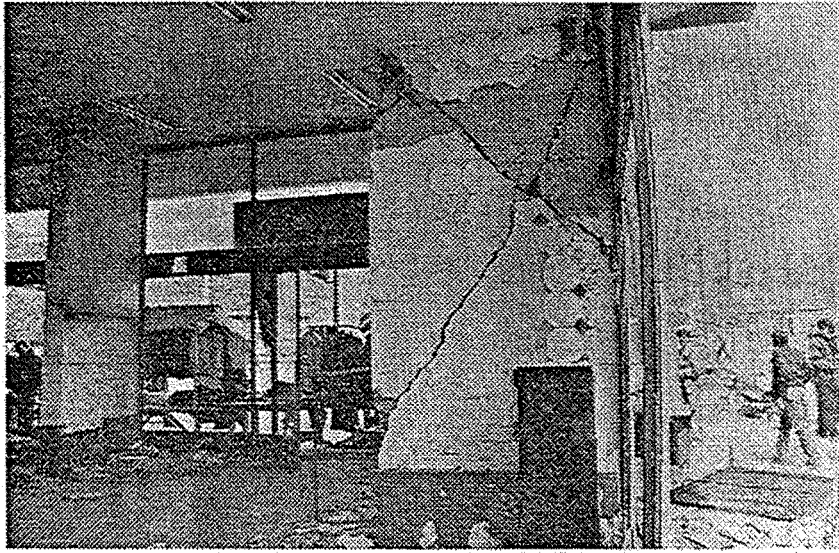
Shear failure of a column in the first floor of building(Erzincan Earthquake[J3])
